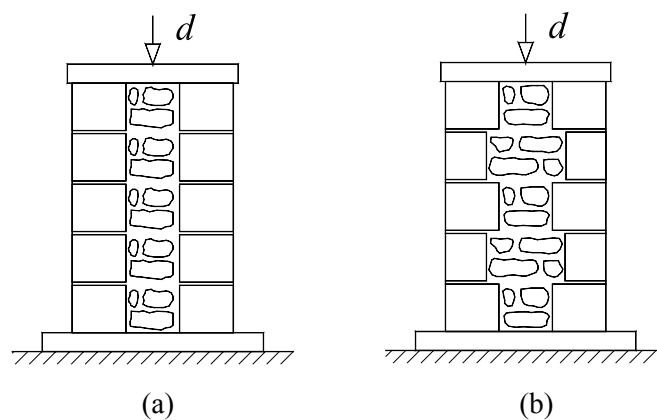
Test setup for the compression tests on full wallets: (a) straight collar joints and (b) keyed collar joints.
